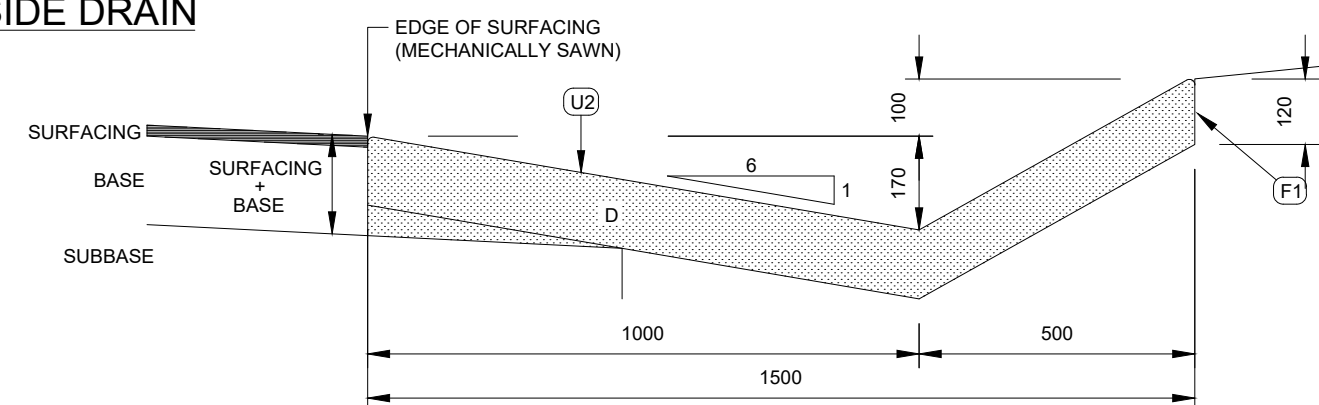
DETAIL OF ENERGY BREAKER SYSTEM AT DISCHARGE POINT OF TYPE 'F' CONCRETE SIDE DRAIN
